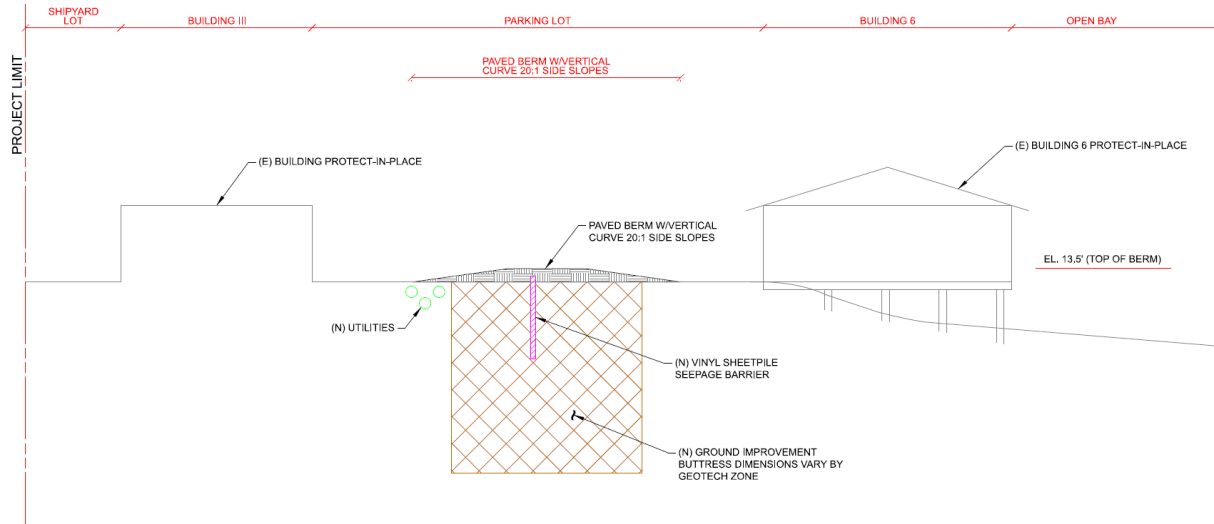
Section 9 Recommended Plan (Reach 3, Mission Bay)
